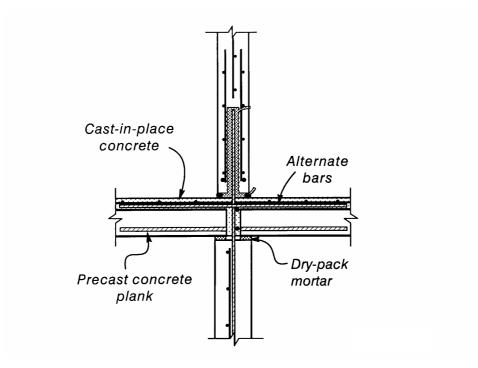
Interior wall-floor slab connection detail: Continuous wall
